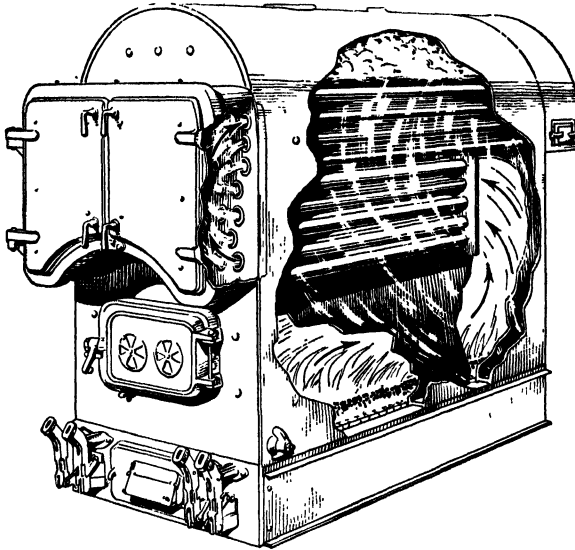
Three-pass water-leg steel-heating boiler. (*Filtzgibbons Boiler Co., type D.*)
